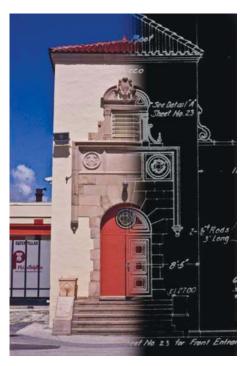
West High Service Pump Station, Constructed 1926. Photo of Current Building Overlaid With Original Design. hen the West Palm Beach Water Treatment Plant (WTP) was built by industrialist Henry Flagler in 1894, the facility used an average of four cords of wood per day to pump 1.5 mil gal of water per day (mgd) to Palm Beach and surrounding areas. Although the steam-driven pumps are long gone and the capacity of the facility has grown to 47 mgd, the founder of the Florida East Coast Railroad and Palm Beach would be proud to see his water WTP modernized with 21st-century technology.
